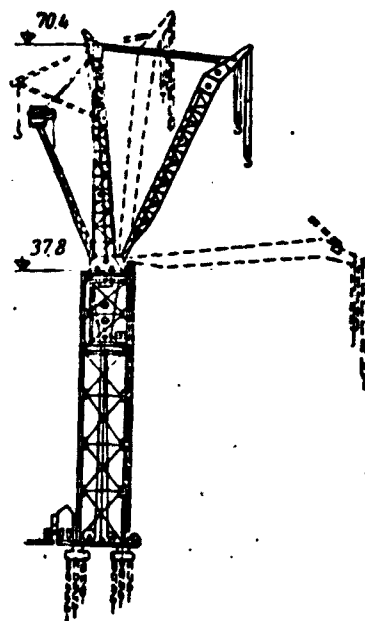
Tower crane, used in construction of blast furnace in Newcastle.
